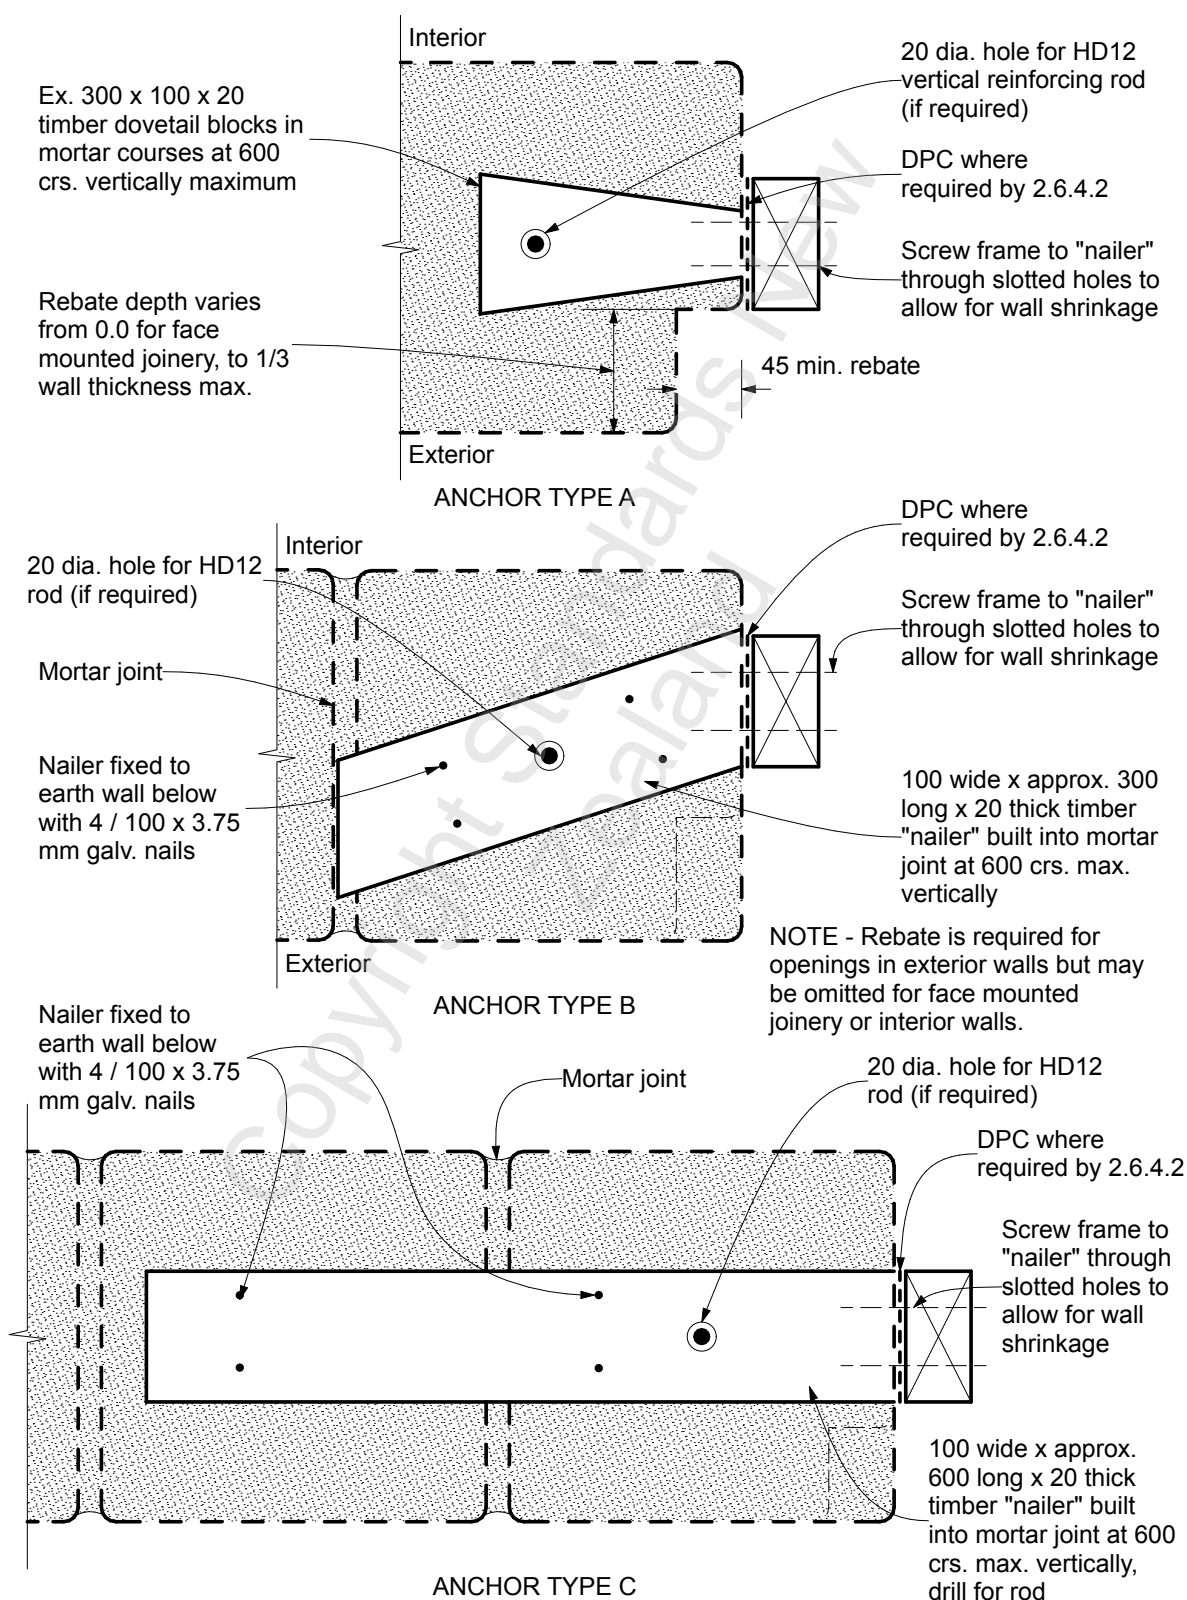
Anchors for door, window, and timber partition frames for earth walls
